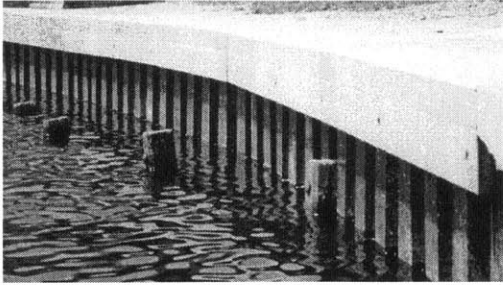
Use of FRP Rebars in Construction (Marshall Industries)
